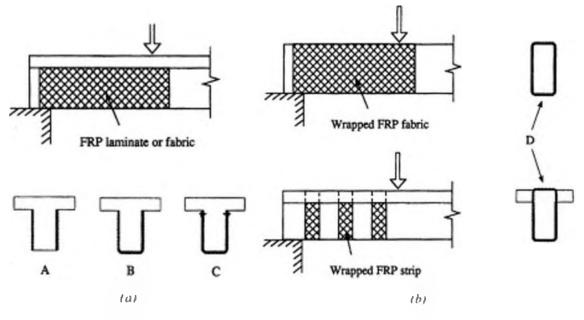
Concrete shear reinforcement with FRP: a) laminates or textiles (b) strips or bundled textiles
